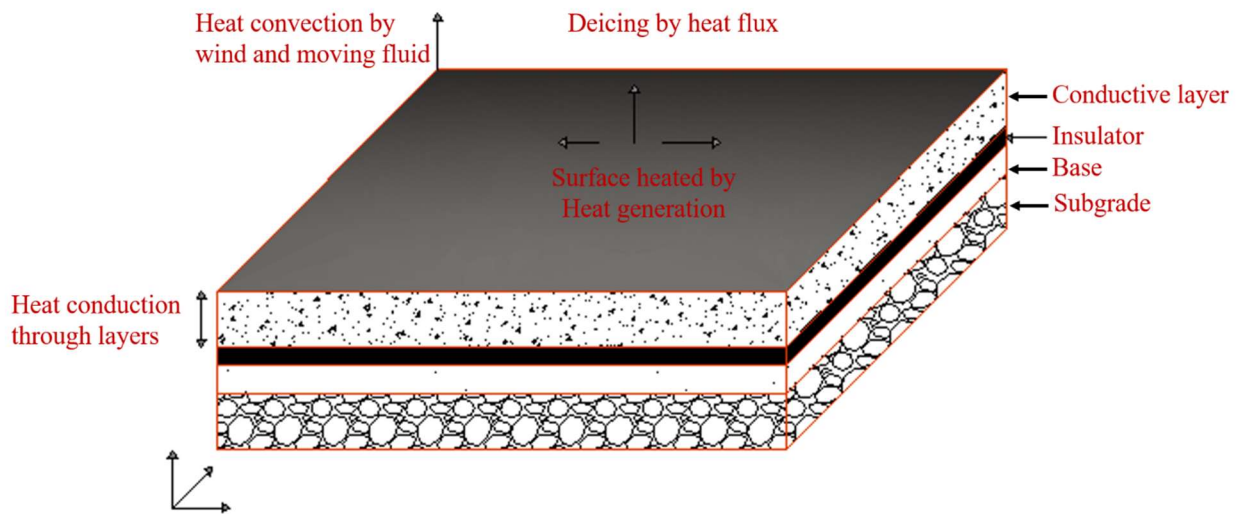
Model of self-deicing electrically conductive concrete pavement.
